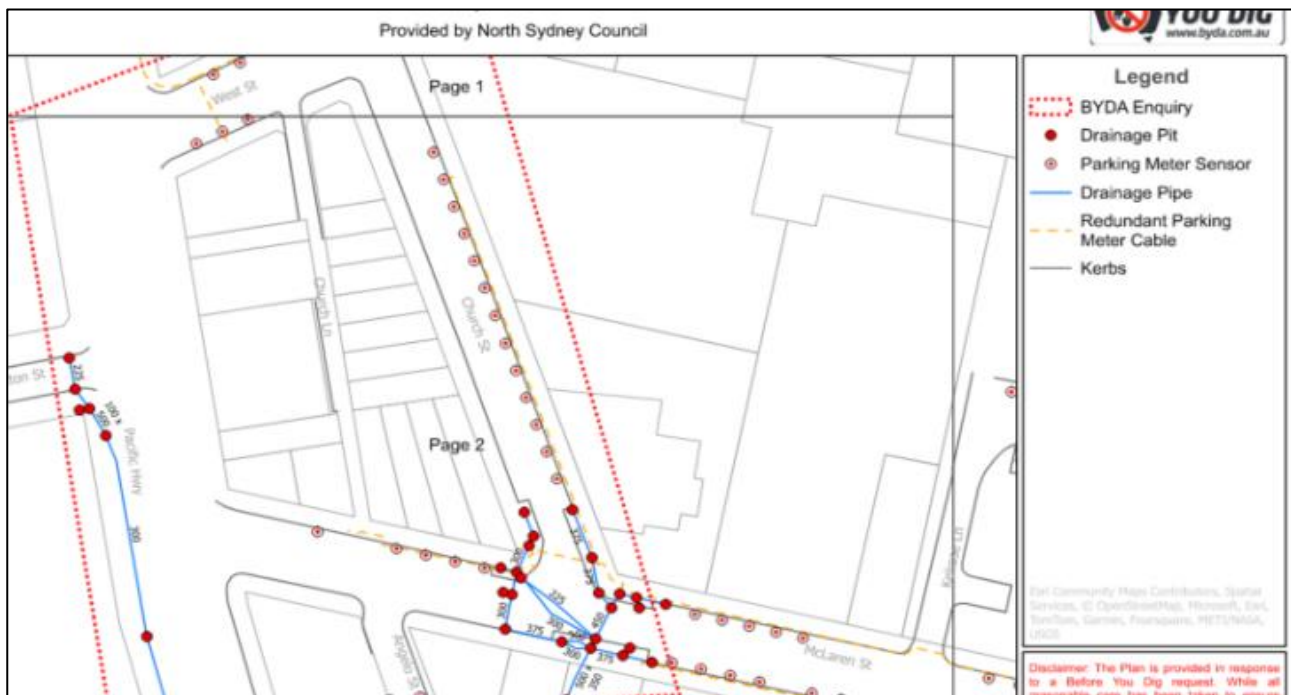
Existing connection pit location (Source: North Sydney Council drawings, DBYD)
